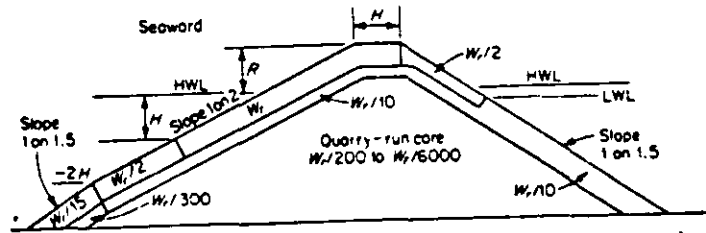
A rubble-mound breakwater in section: HWL, High-water level; LWL, low-water level; R, wave run-up.
